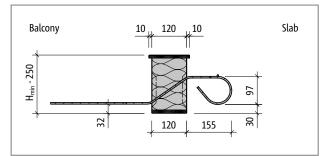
Schöck Isokorb® XT type Q-Z-V1 to Q-Z-V4: Product section
